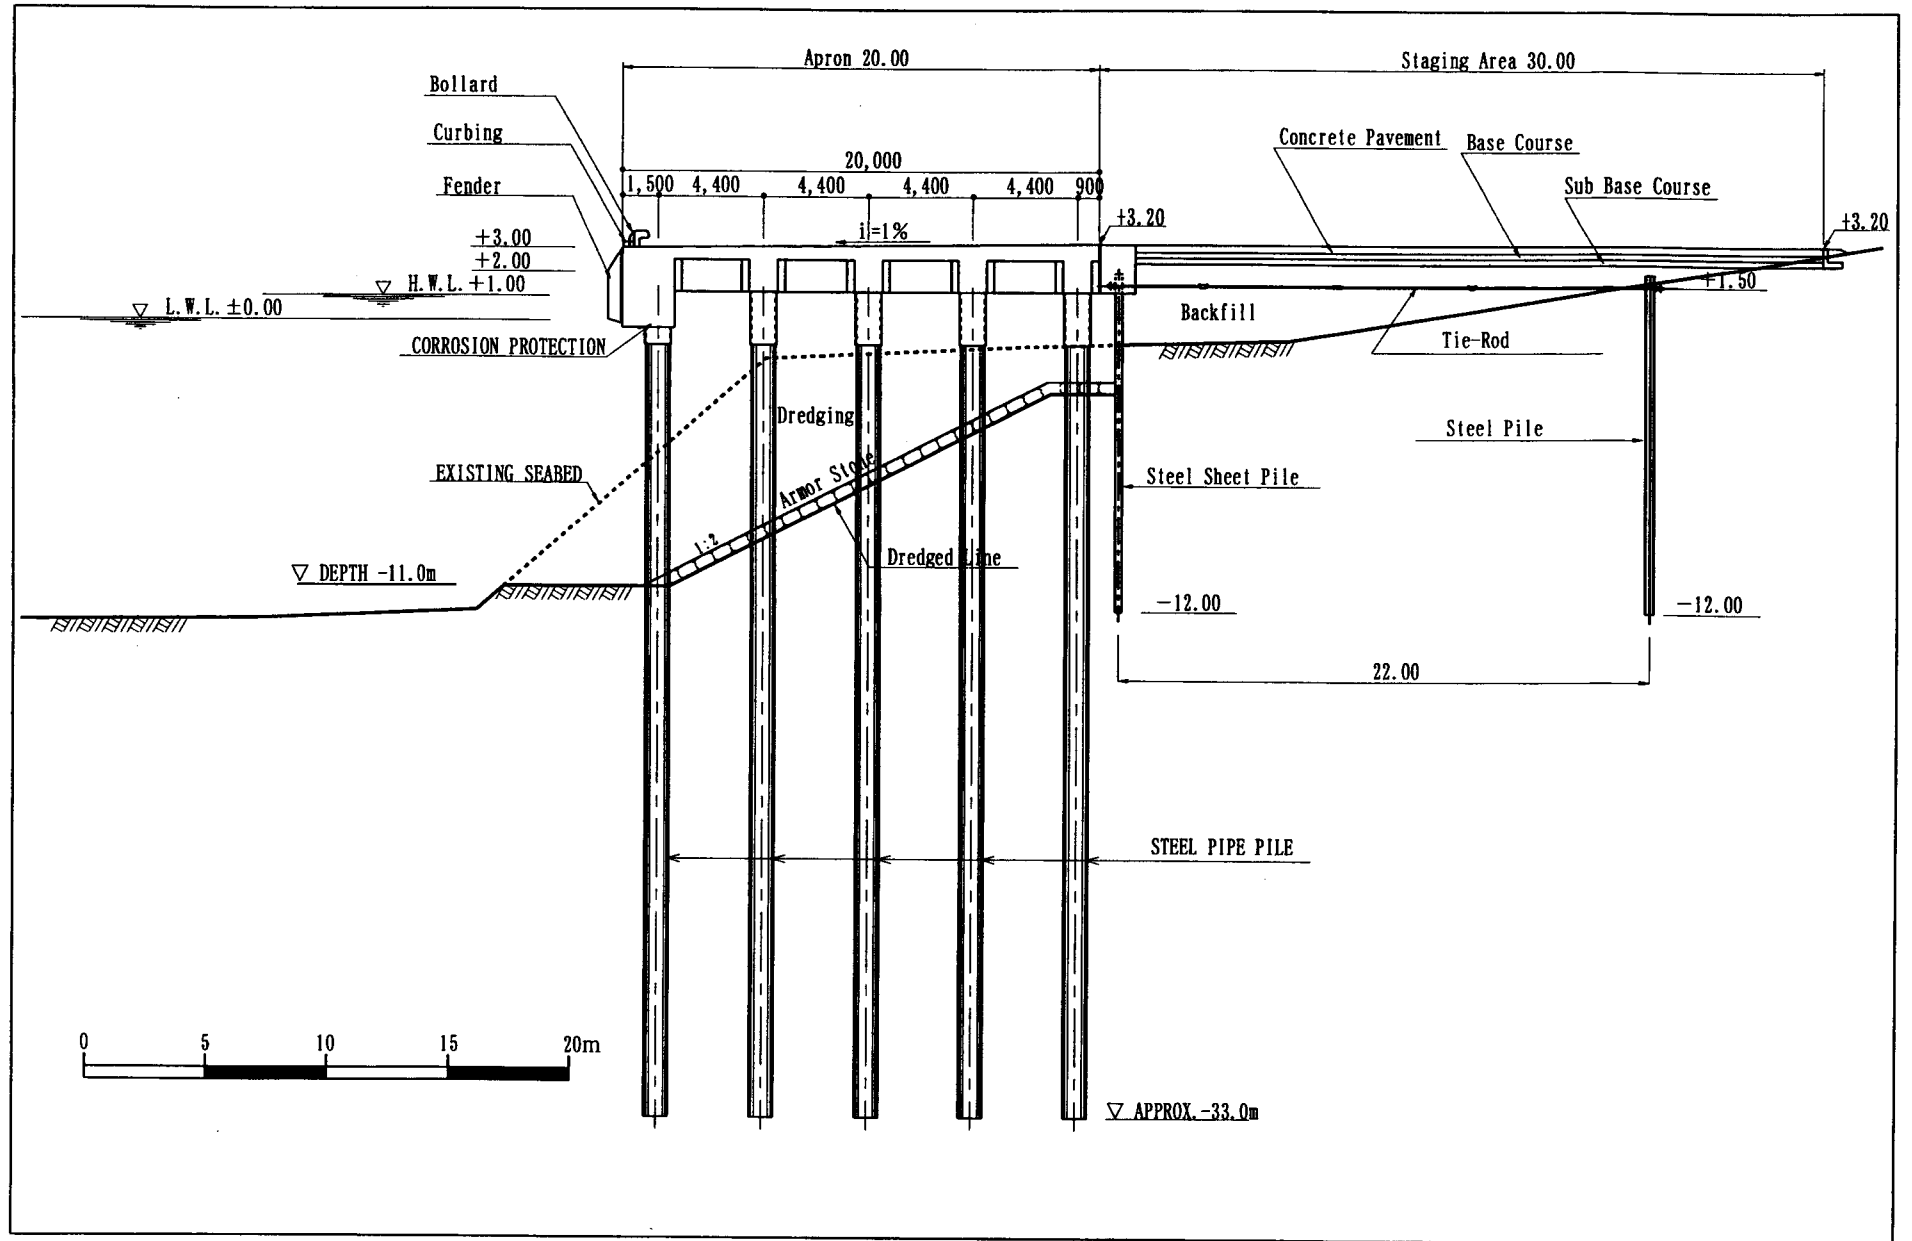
Open Type Piers with Vertical Piles for New Wharf (Type B)
